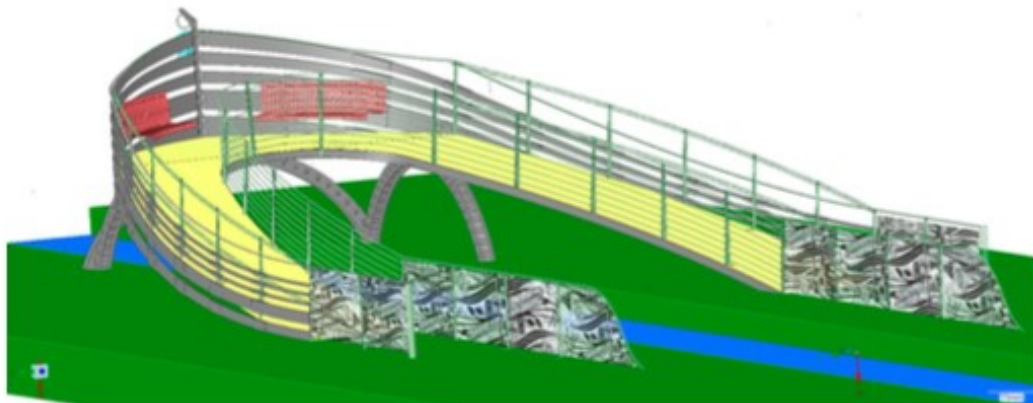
The barge shape is plain to see, with the primary external handrail being formed from iron bar shaped as rope.
